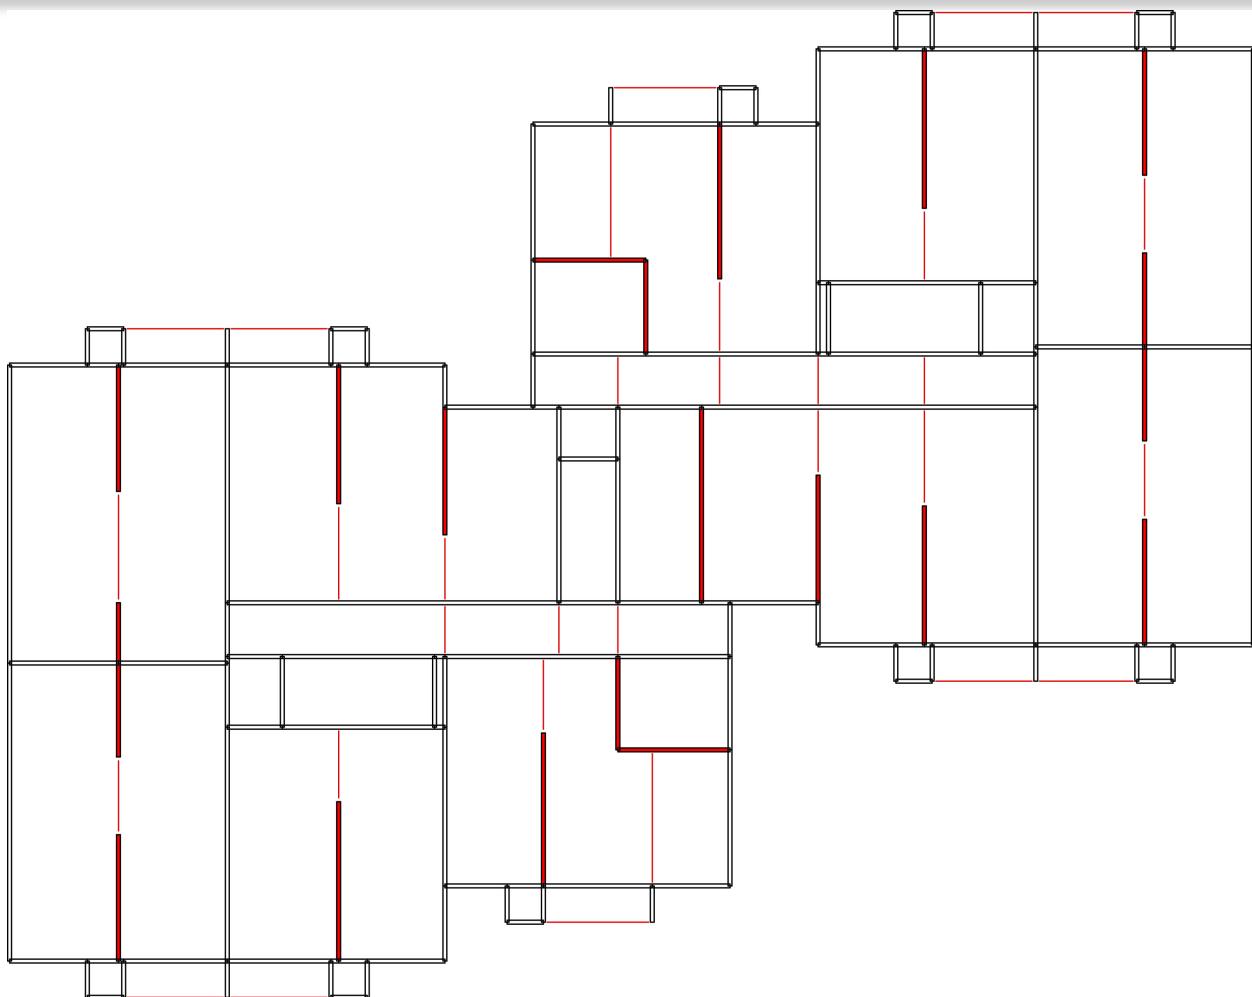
Typical Layout (levels 2-7) showing steel beams and reassigned interior partition walls as load bearing in red.
